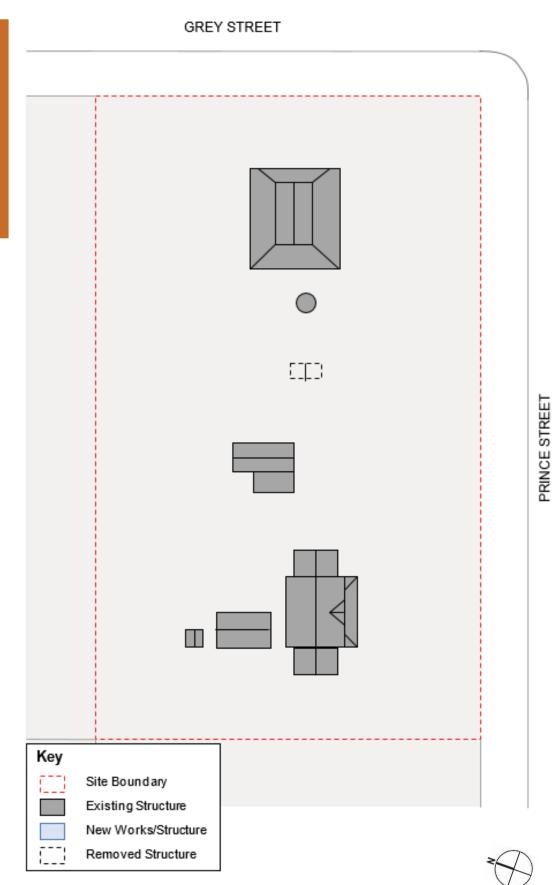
Clarence Town Courthouse and site period of construction - 1970
